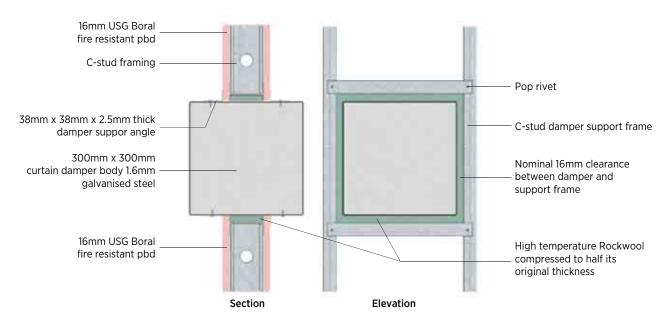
Typical Fire Damper Detail - FRL 60/60/60 Steel Stud Wall
